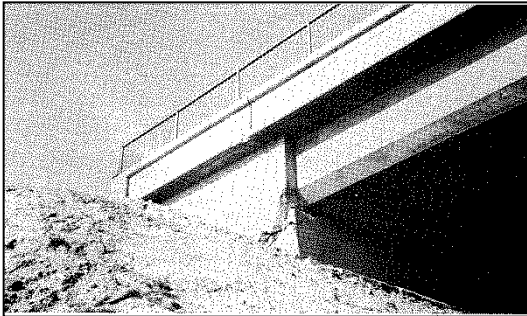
Roxford Street Undercrossing – damage to eastern abutment
